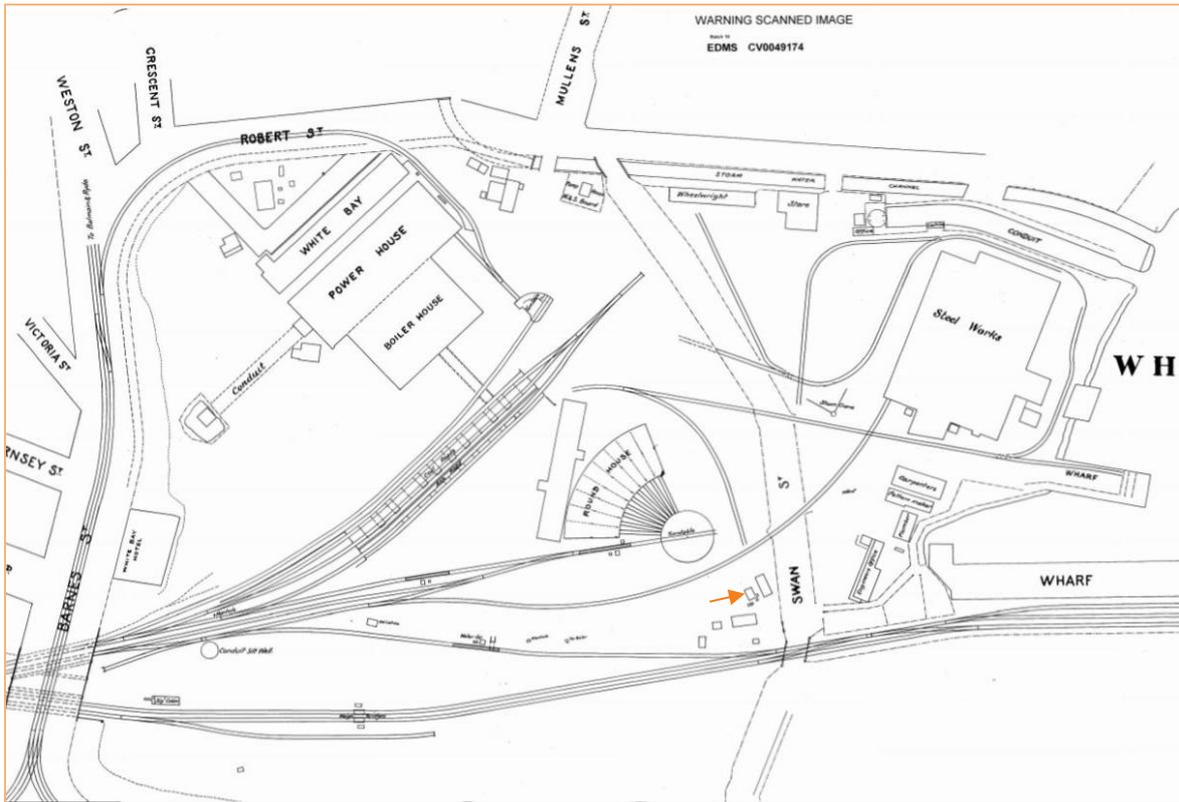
Detail from 'N.S.W.R. - White Bay – Site Plan of Round House', dated June 1919. It shows the location of buildings, water conduit, round house, turntables, wells, vents, boilers, and tracks. Source: Transport for NSW Plan Room, 0049174
